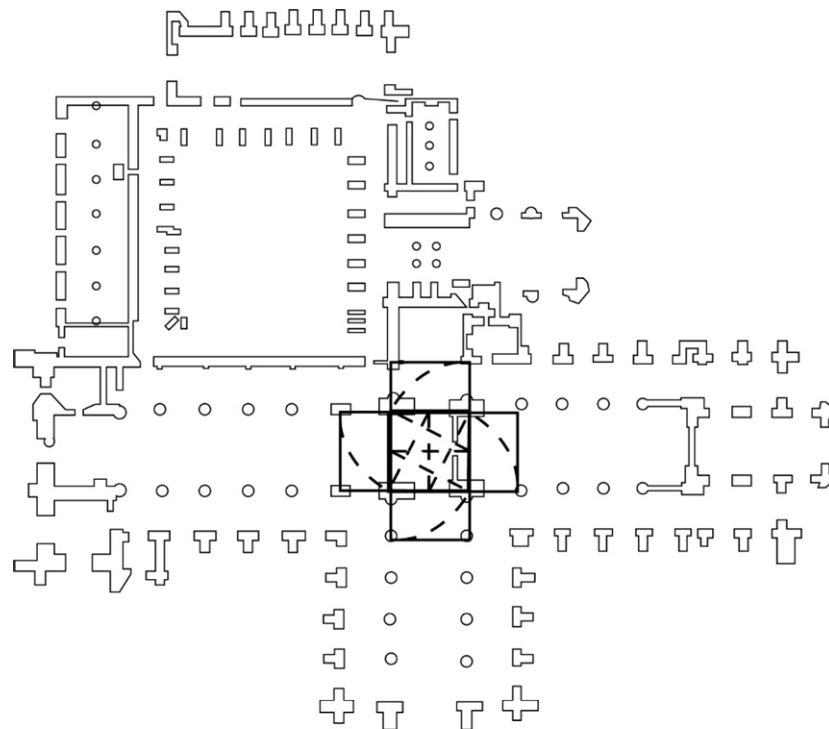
8 The floor plan of Chester Cathedral (location: Chester UK, year built: 1541)
